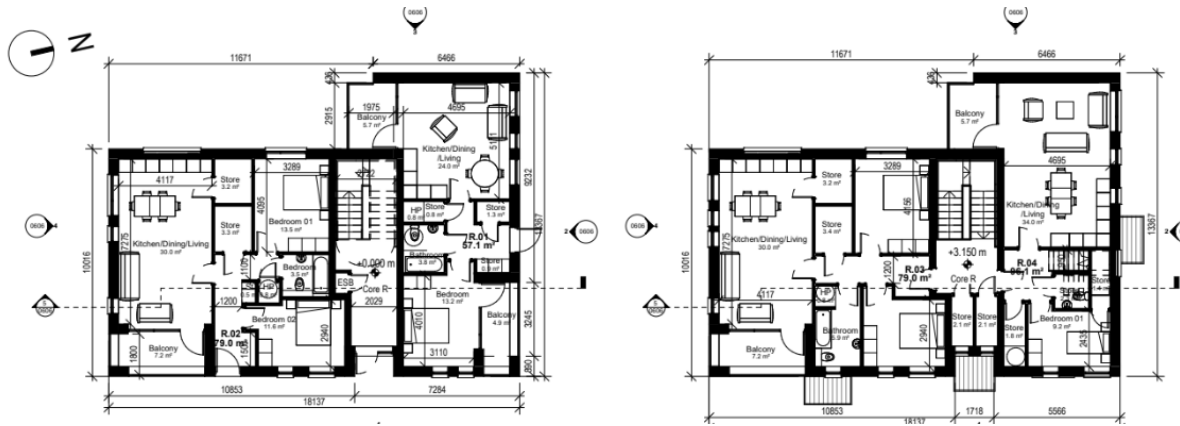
Proposed ground (left) and first (right) floor plans of Duplex Block Type R
